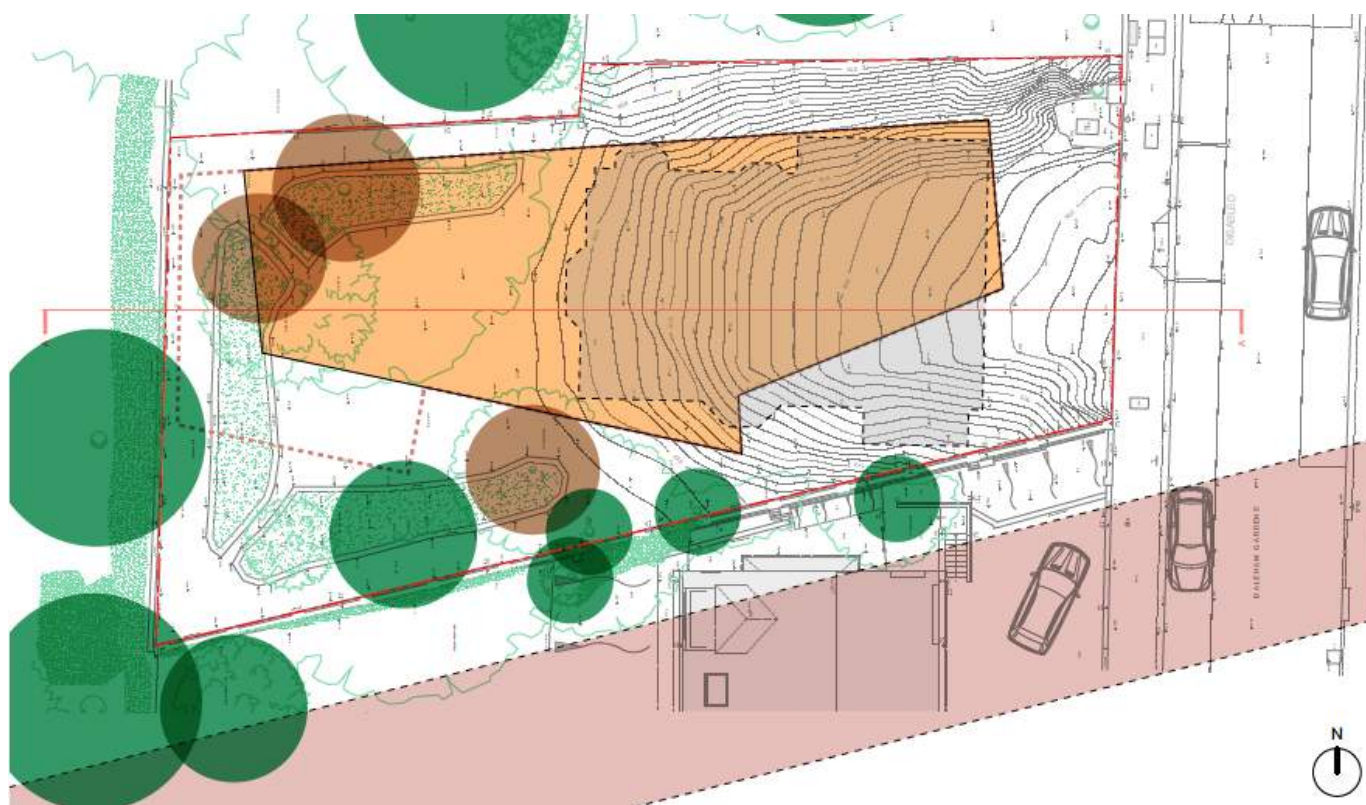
Extract of Simple Works Constraints Plan (Drg 1803-XX-SK-01)
